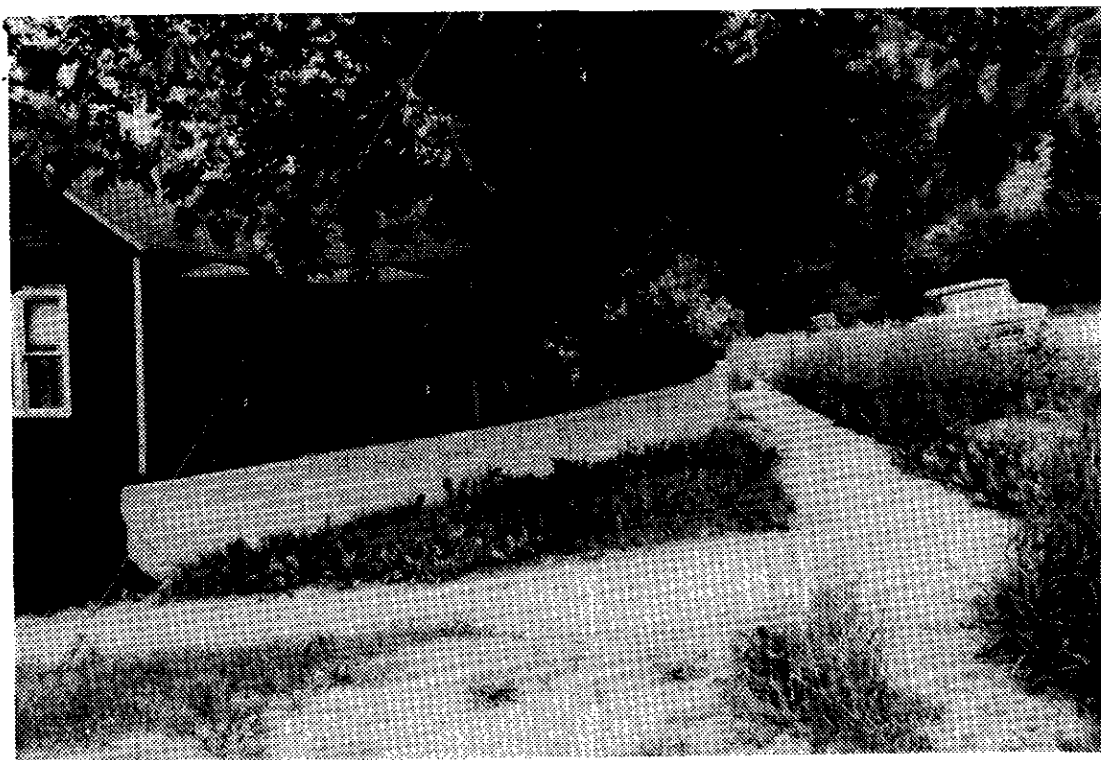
Concrete floodwall diverts flow around house, Ouray, CO.
